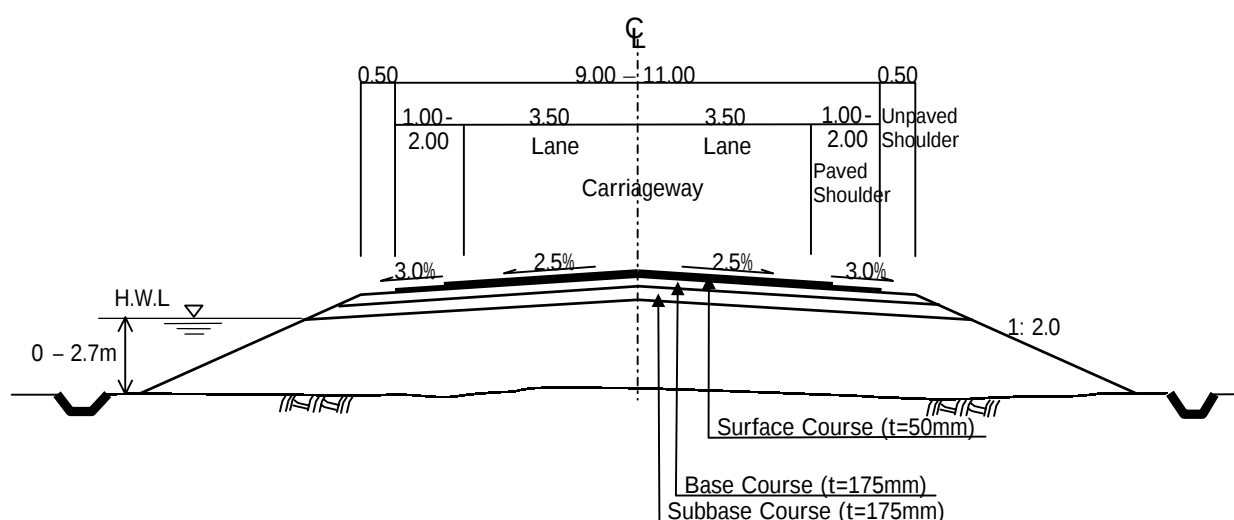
Typical Cross Section for Alternative 1 (L = 18.6km)
